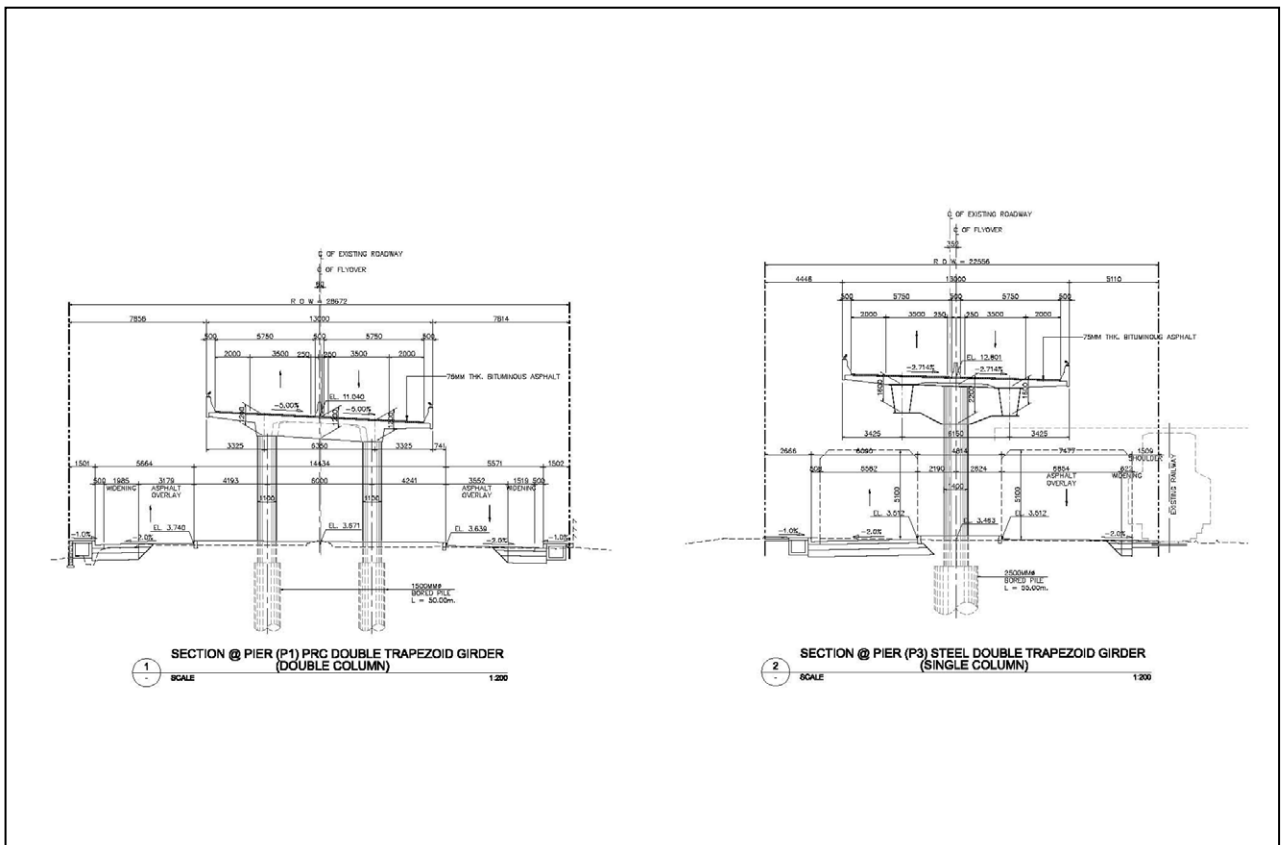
TYPICAL CROSS SECTION (TANGGULANGIN)
